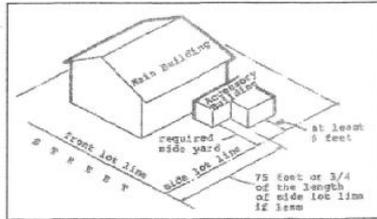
Accessory Building or Structure in Side Yard in S, SC, T, F, or M Districts
